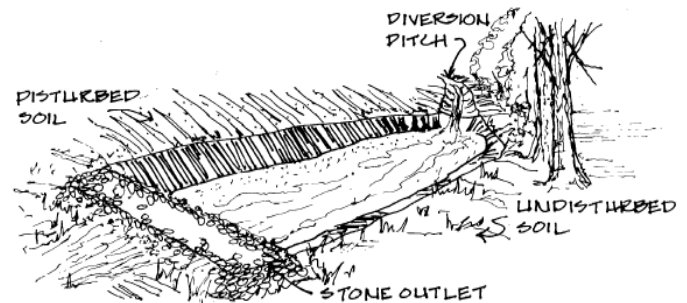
Sediment trap schematic (from MA Unpaved Road BMP Guide)
